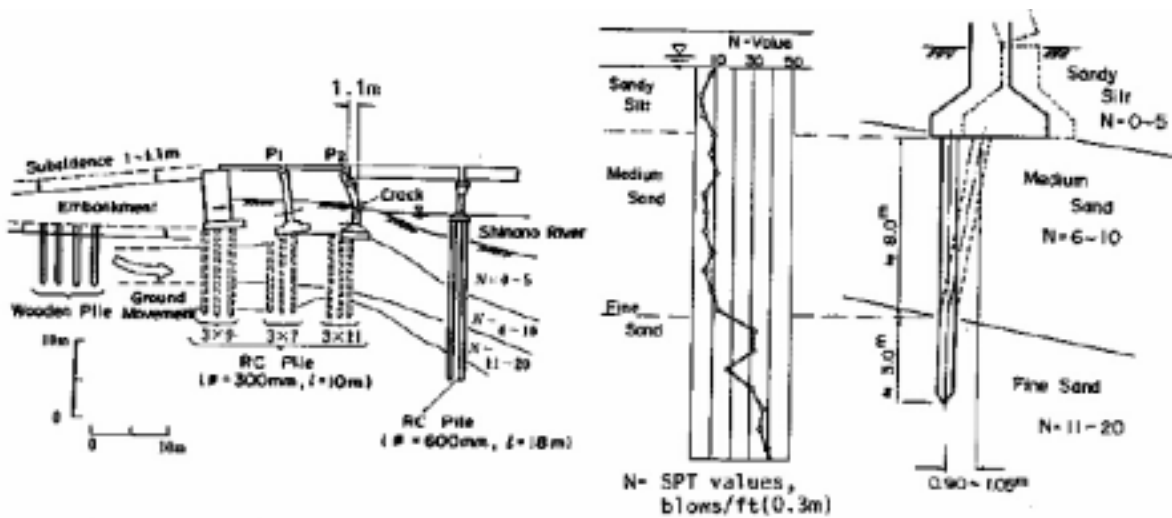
Damage to Yachiyo Bridge 5, 6
